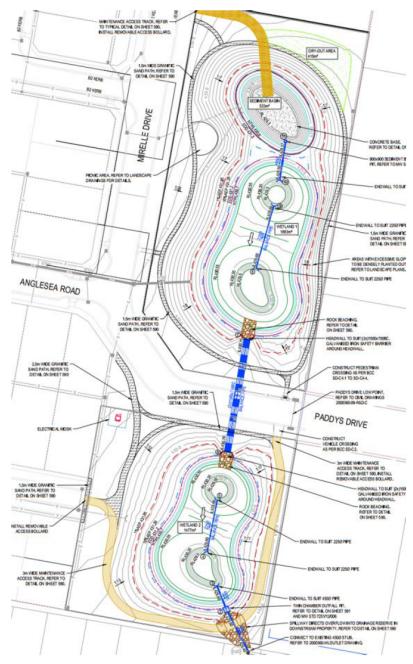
RETARDING BASIN 5 LAYOUT
